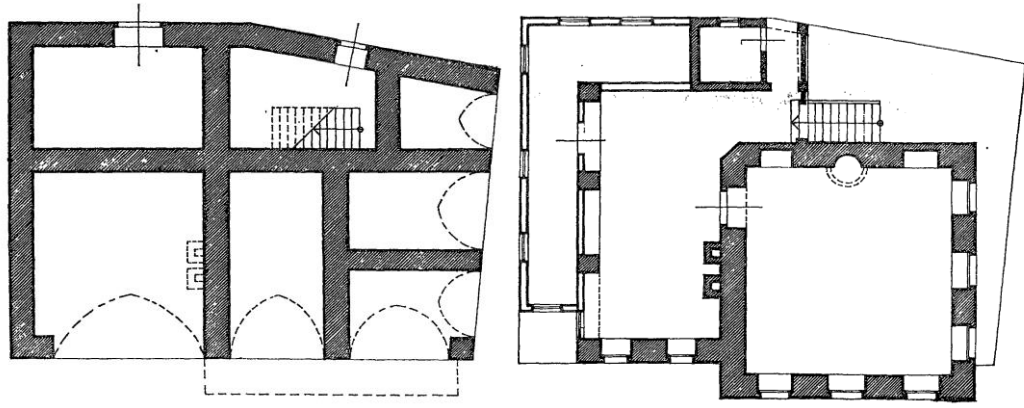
Sketches of Ground and First Floors plans of Saliha Sultan Primary School (Eyice, 1982, drowned by Baha Tanman).
